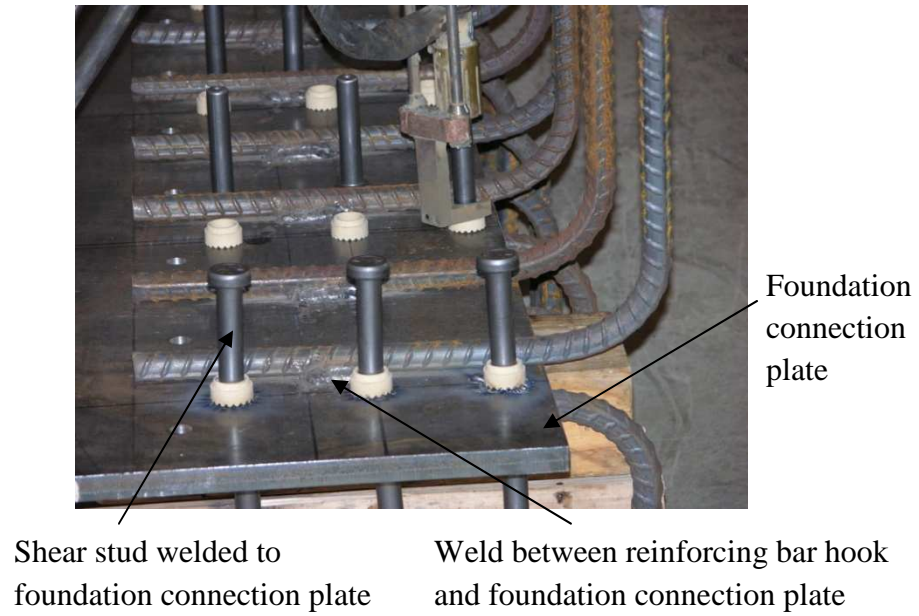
Reinforcing bar hooks and shear studs welded to foundation connection plate
